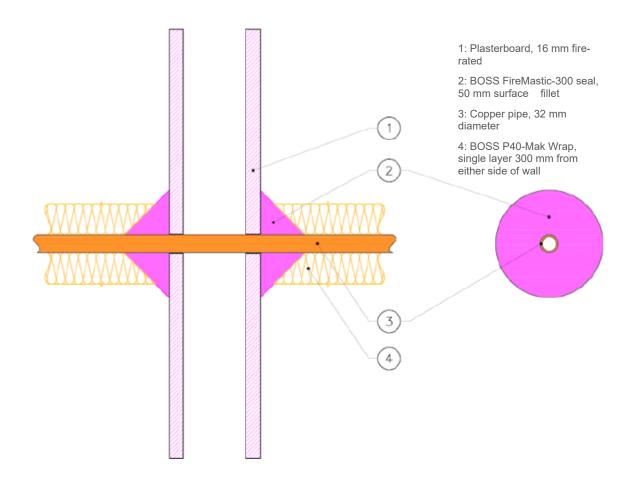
Specimen 7 in test report FSP 1833 - 31.75 mm OD copper pipe penetrating a plasterboard wall system
